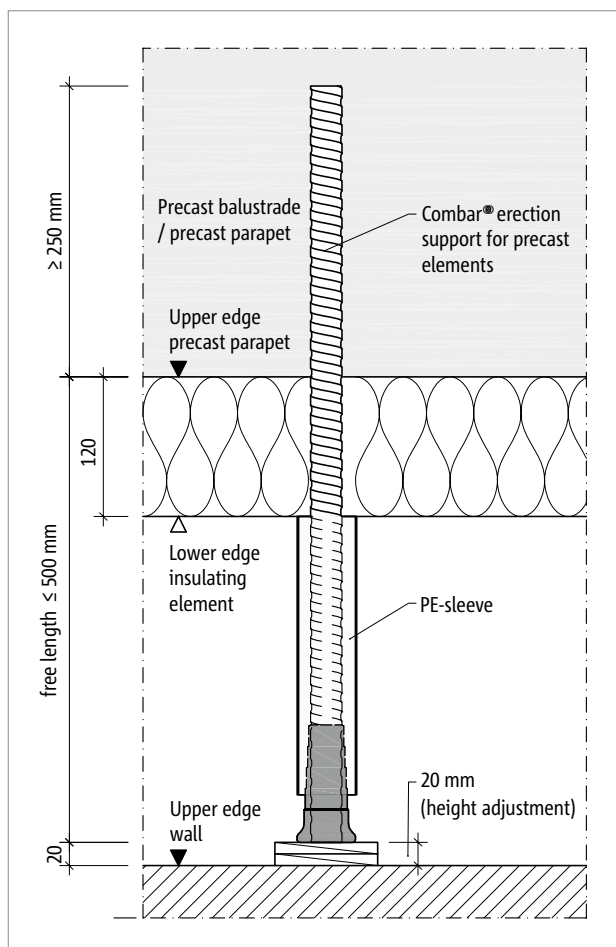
Schöck Combar® erection support for precast elements: planning dimensions
